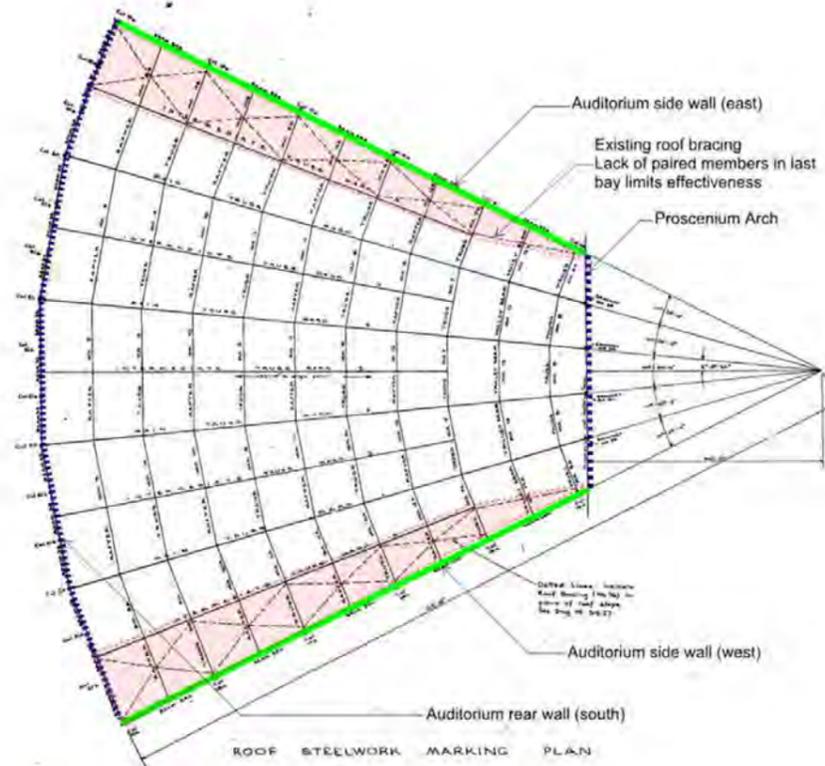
Original auditorium steel framing plan indicating walls and bracing
